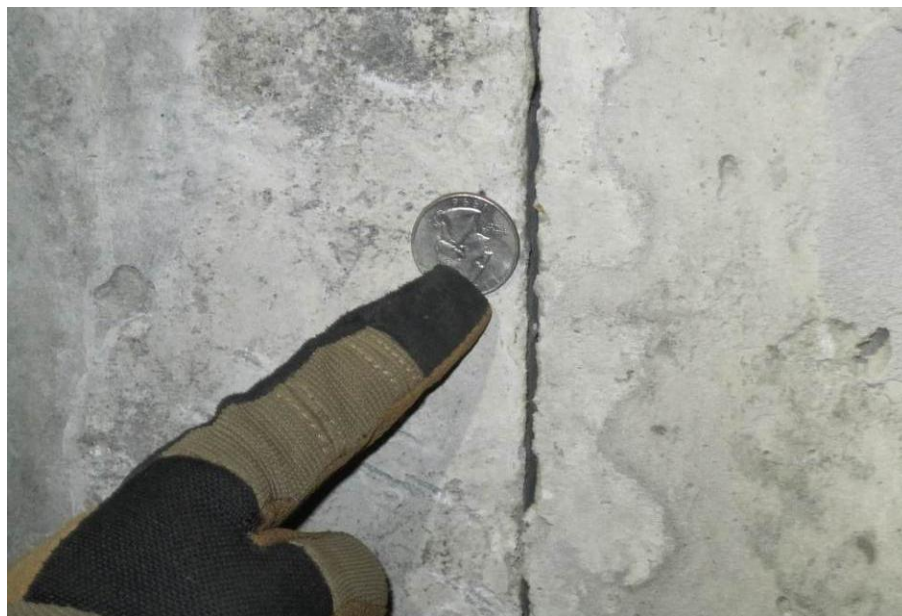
Joint Opening Located in the wall of Corridor X Culvert at 4959+43
